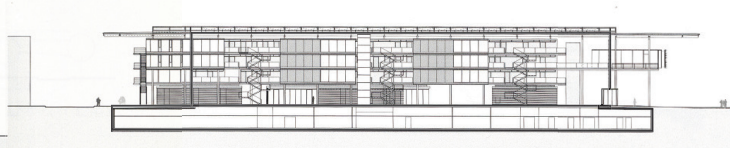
Longitudinal section (Research and Technology Buildings, 2005)
